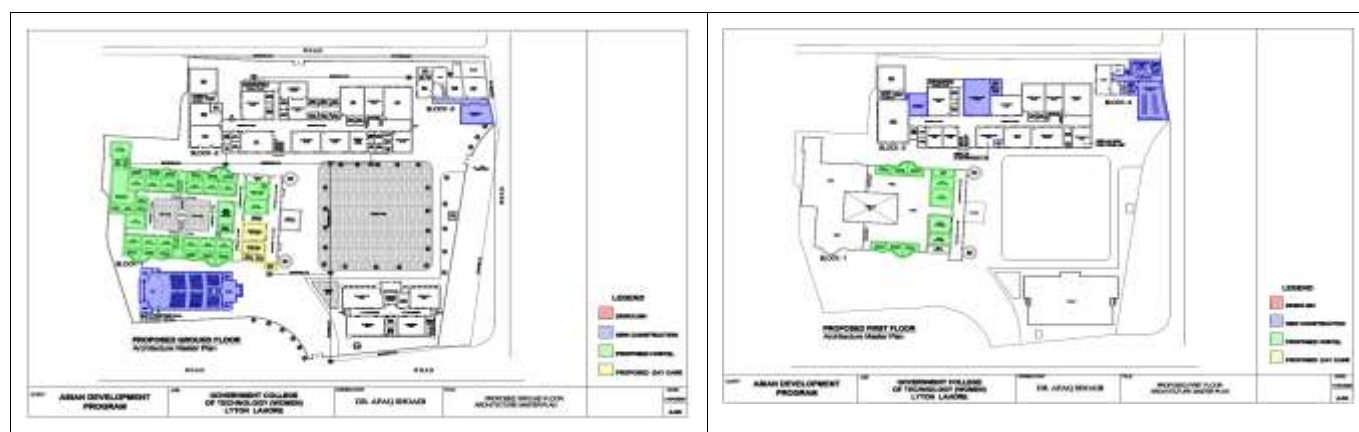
A: Designed layout (G.floor and 1st floor) for GCT (W) Lahore
